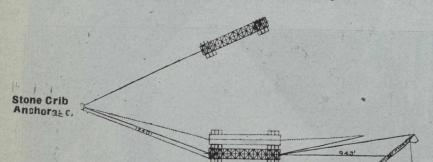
Diagram Showing Method of Anchorage While Floating Span Away from Erection Site
